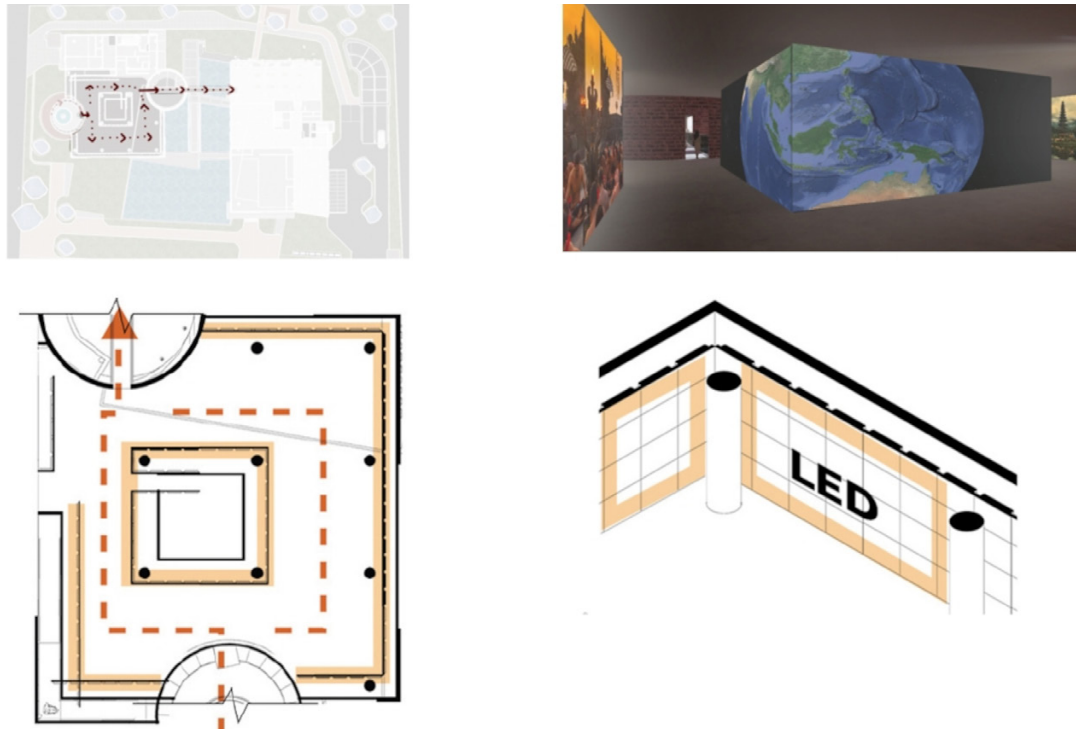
Plan and section drawing of the Sadrah space (Image by authors)
